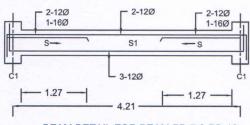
# DETAILED DRAWING OF REINFORCEMENT OF BEAMS AT PLINTH LEVEL
